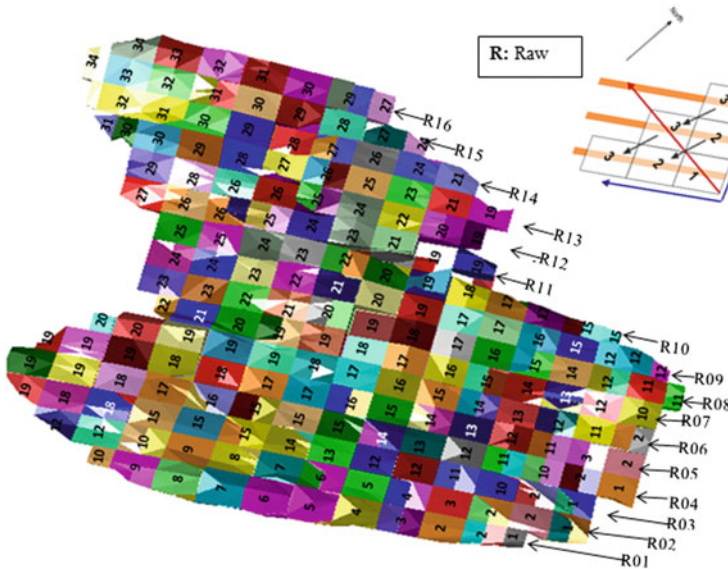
Lode 9101—Transverse advance facing (plan view)
